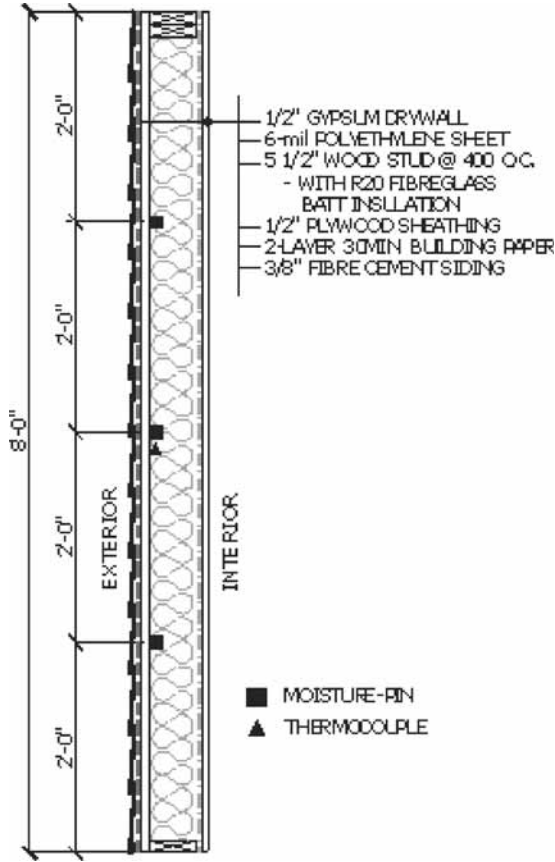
Vertical cross-section of the instrumented conventional wall system.
